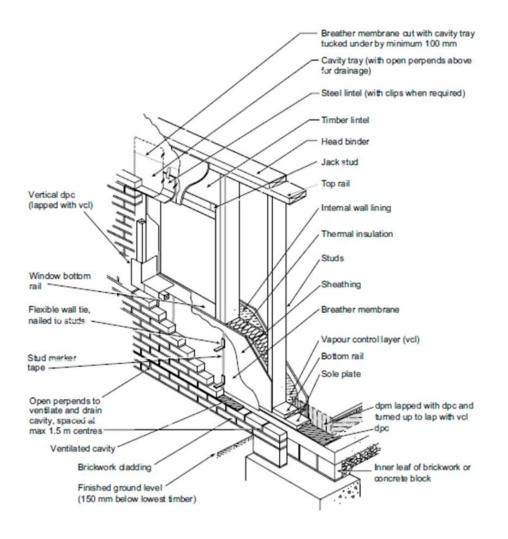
Externally sheated timber frame wall with brick cladding(TRADA,2016)
